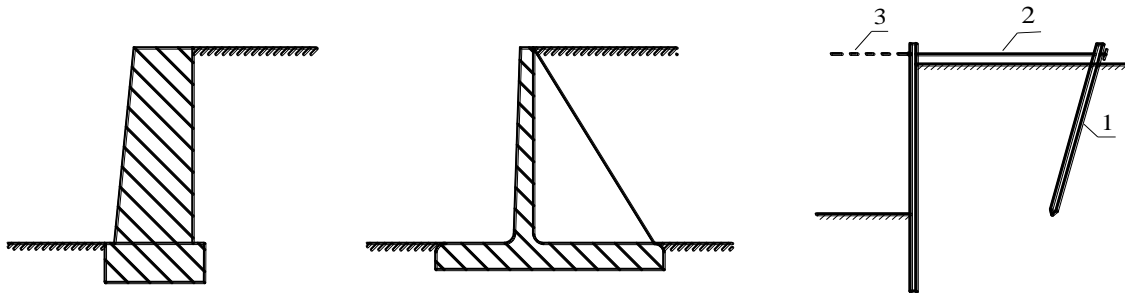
Gravity, flexible and sheet-pile retaining walls: 1 – anchor pile, 2 – tension bar, 3 – distance bar.
